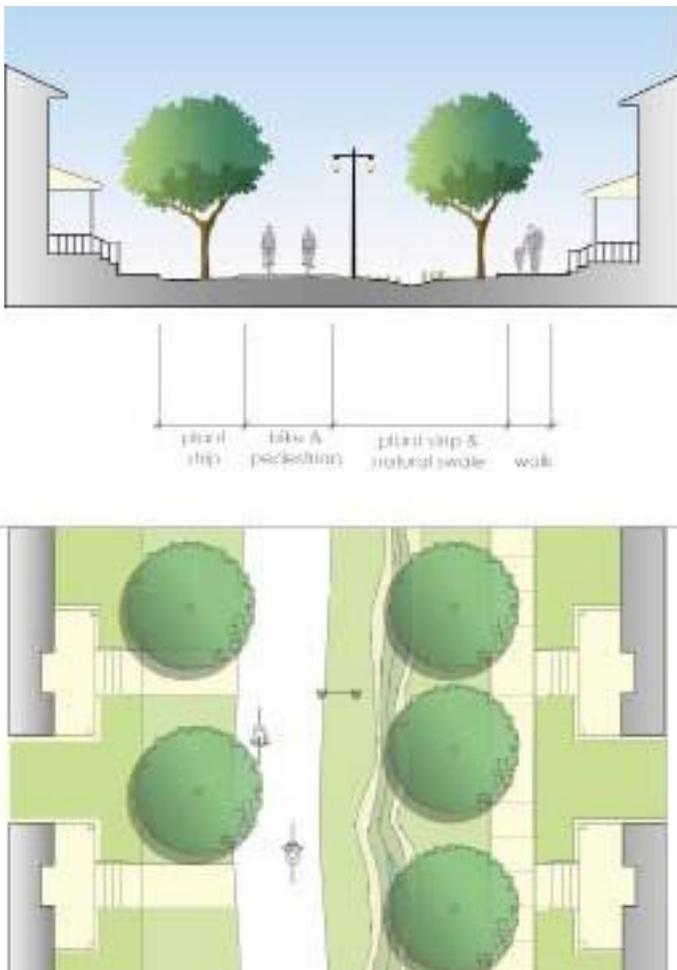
North-South Class I, Multi-Use Paseo Concept Plan
